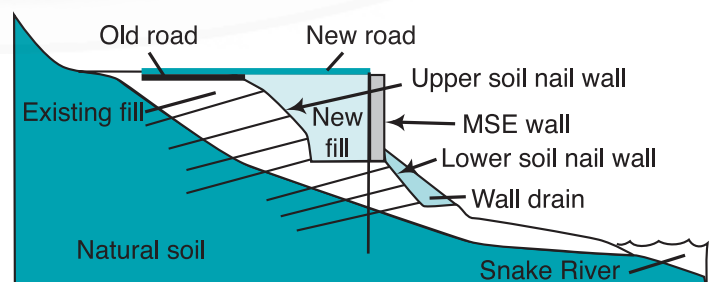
Schematic cross section of construction techniques used at the Elbow Slide, Snake River Canyon, Wyoming. Not to scale.
